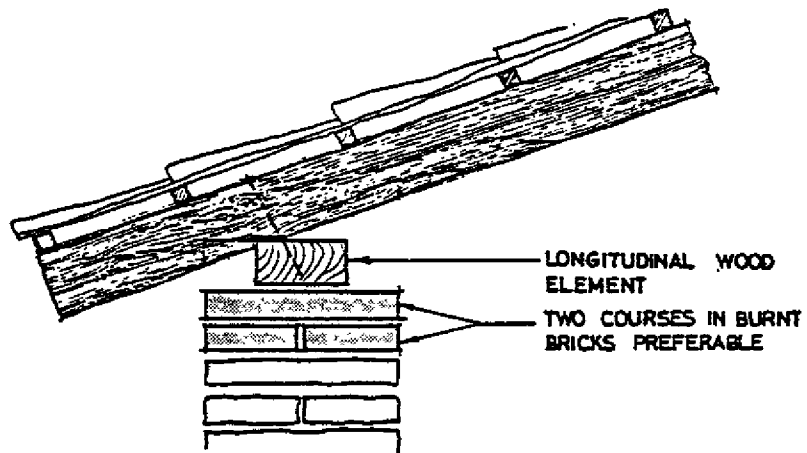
USE OF LONGITUDINAL WOOD UNDER ROOF RAFTERS
